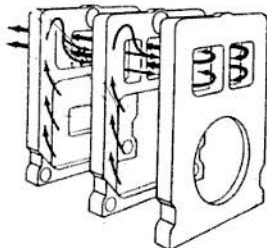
Gas travel through tie-rod assembled-type cast-iron boiler.
